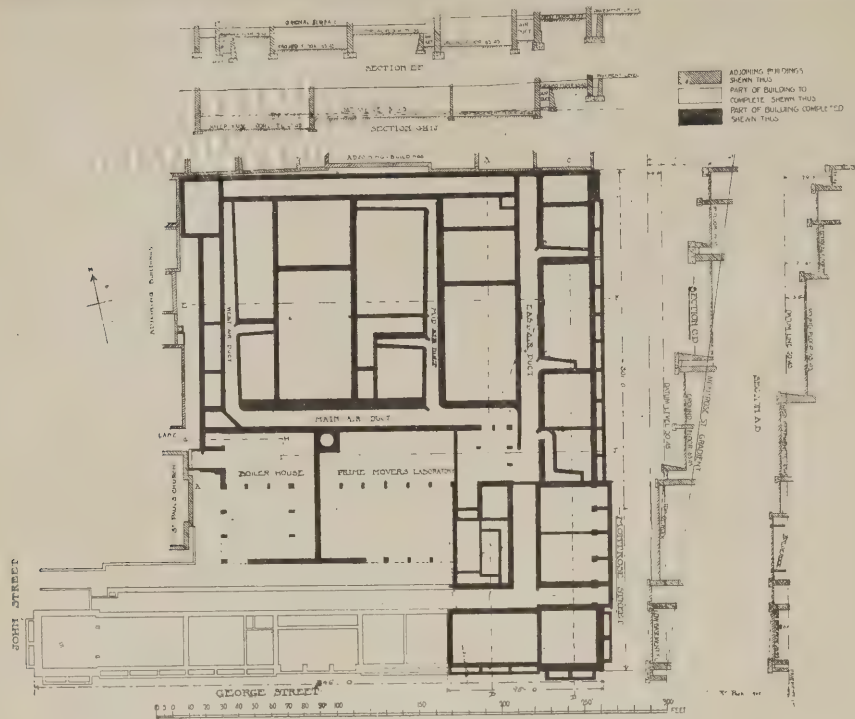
G. ASGOW TECHNICAL COLLEGE: PLAN OF MAIN WALLS AT FOUNDATION LEVEL.
